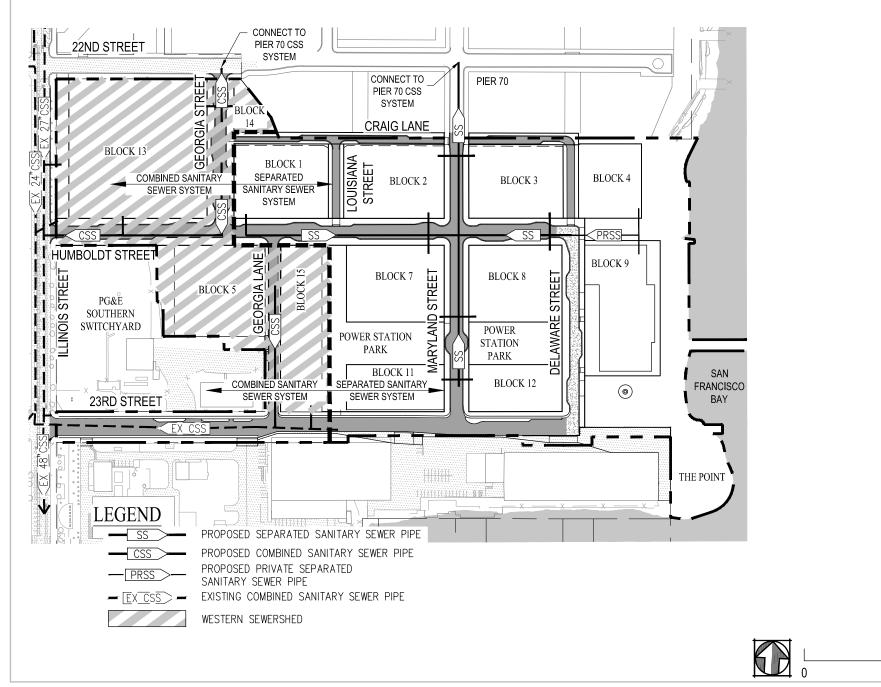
Proposed Separated Sanitary Sewer - Northern Connection Alternative
